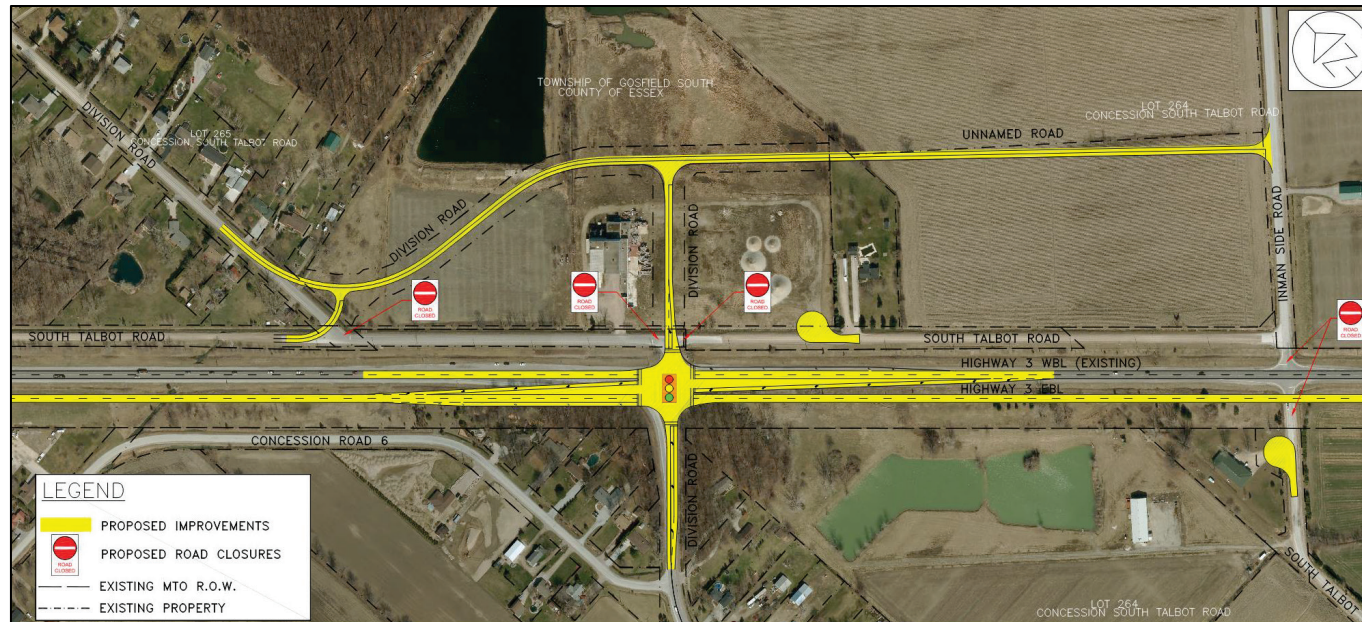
2006 Approved Plan for the Division Road (Essex Road 29) and South Talbot Road Intersections
